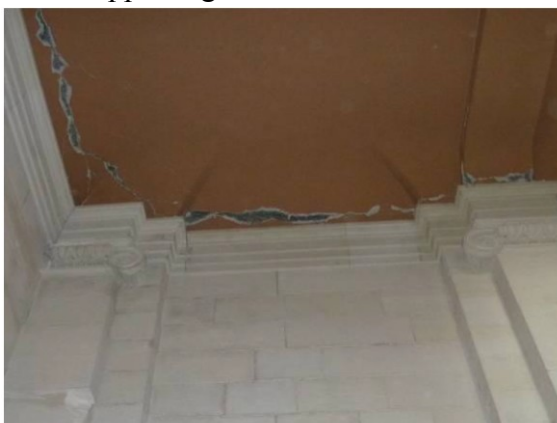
Diaphragm damage at the first floor (its exact position is unknown).
